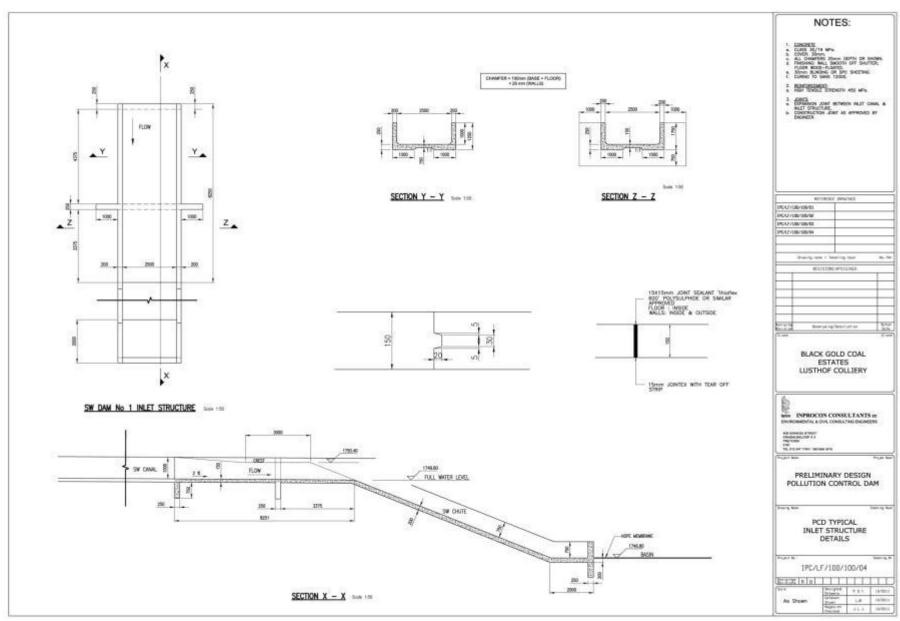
(d): Pollution Control Dam - Typical Inlet Structure Details.
